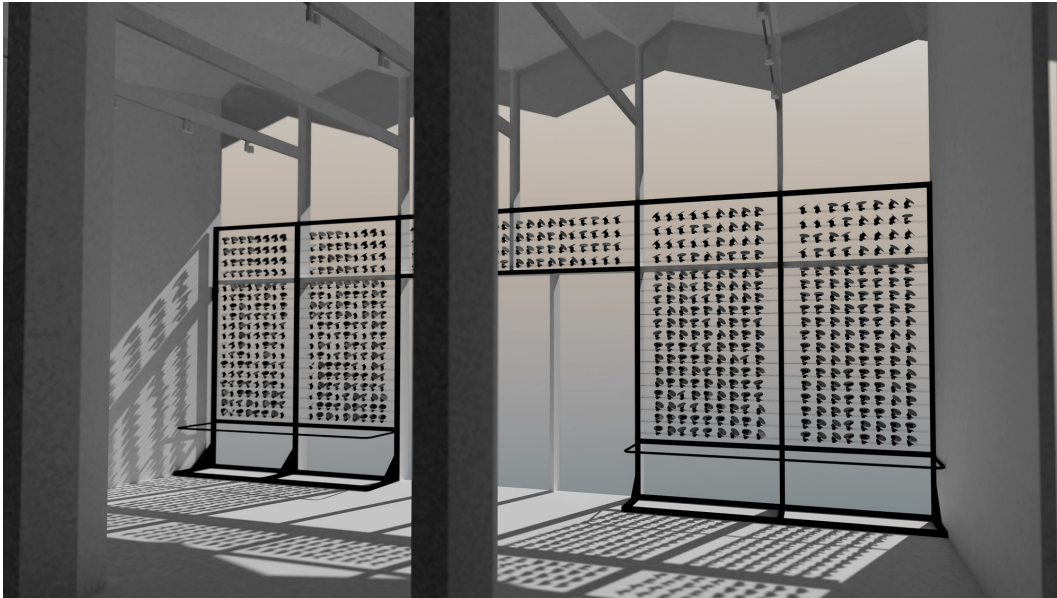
CAD drawing of the Steinberg Hall prototype catoptric surface.
